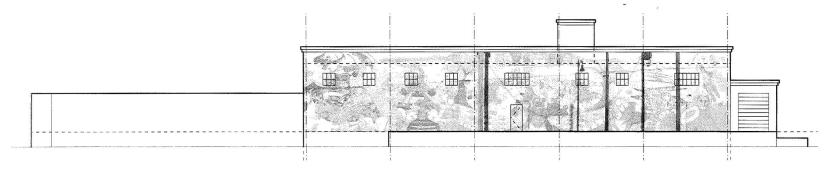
2017 East Elevation with Photographic Overlay of Mural
